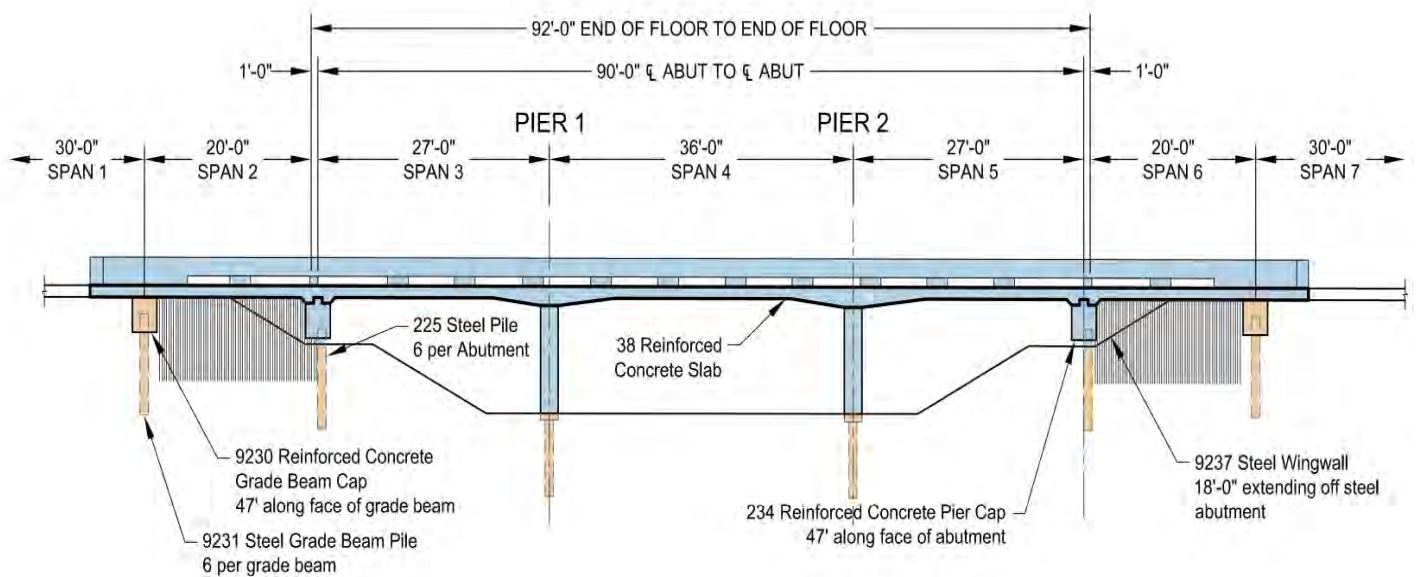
EI.24.3-1: Elevation view of continuous concrete slab bridge
